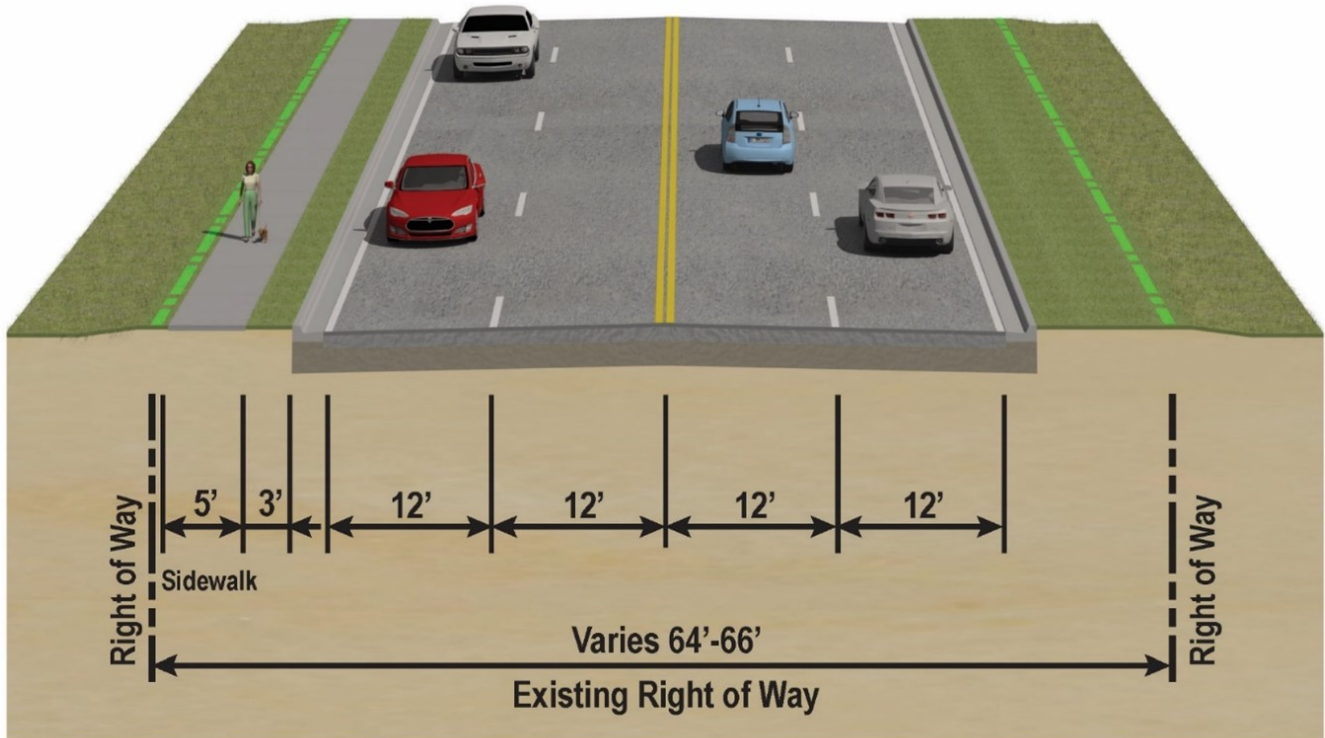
Existing Typical Section - La Vista Drive to SR 17
